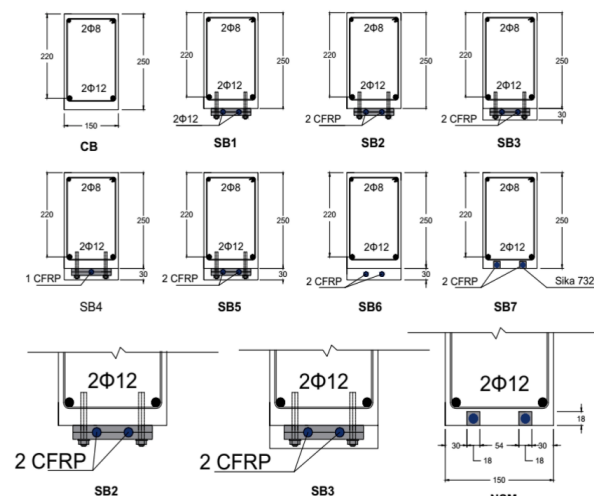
Dimensions and reinforcement details of the cross-sections of beam specimens investigated in study [23]
